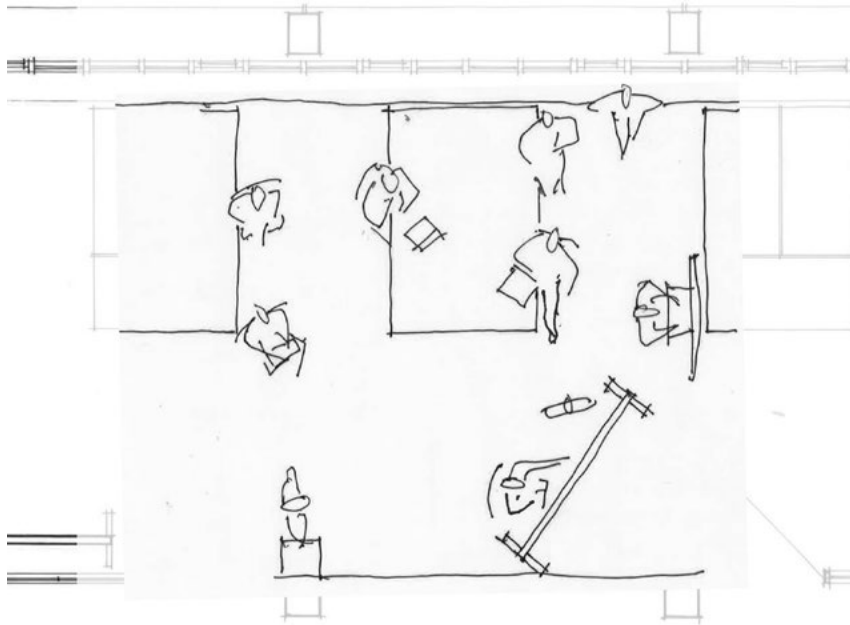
reconstructed plan drawing of the studio review 25.01.22. This was drawn 'freehand' but layered over a measured 1:50 plan I had previously constructed.
